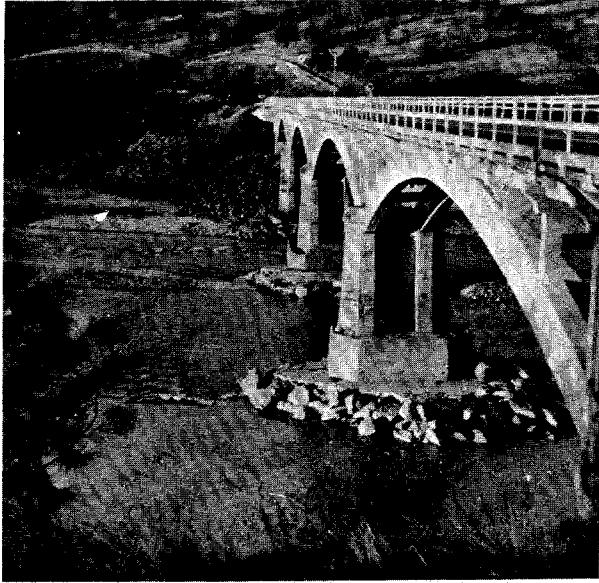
View from left bank of rock riprap around pier, about 1965. (From Calif. Dept. of Transportation.)
